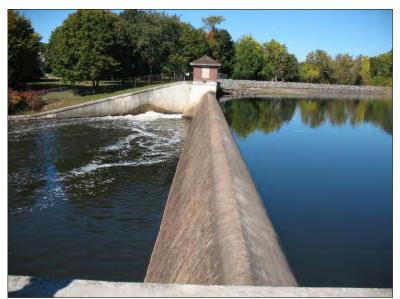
Turner Reservoir Dam. Spillway, outlet works, right retaining wall, and right dike from left embankment.
